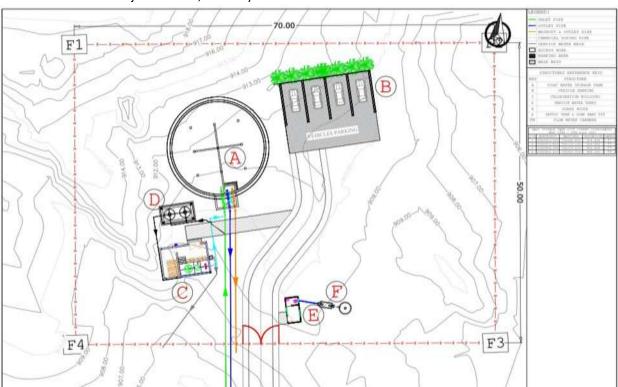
Bahi Storage Tank - Site Layout of 500 m3 Reservoir
